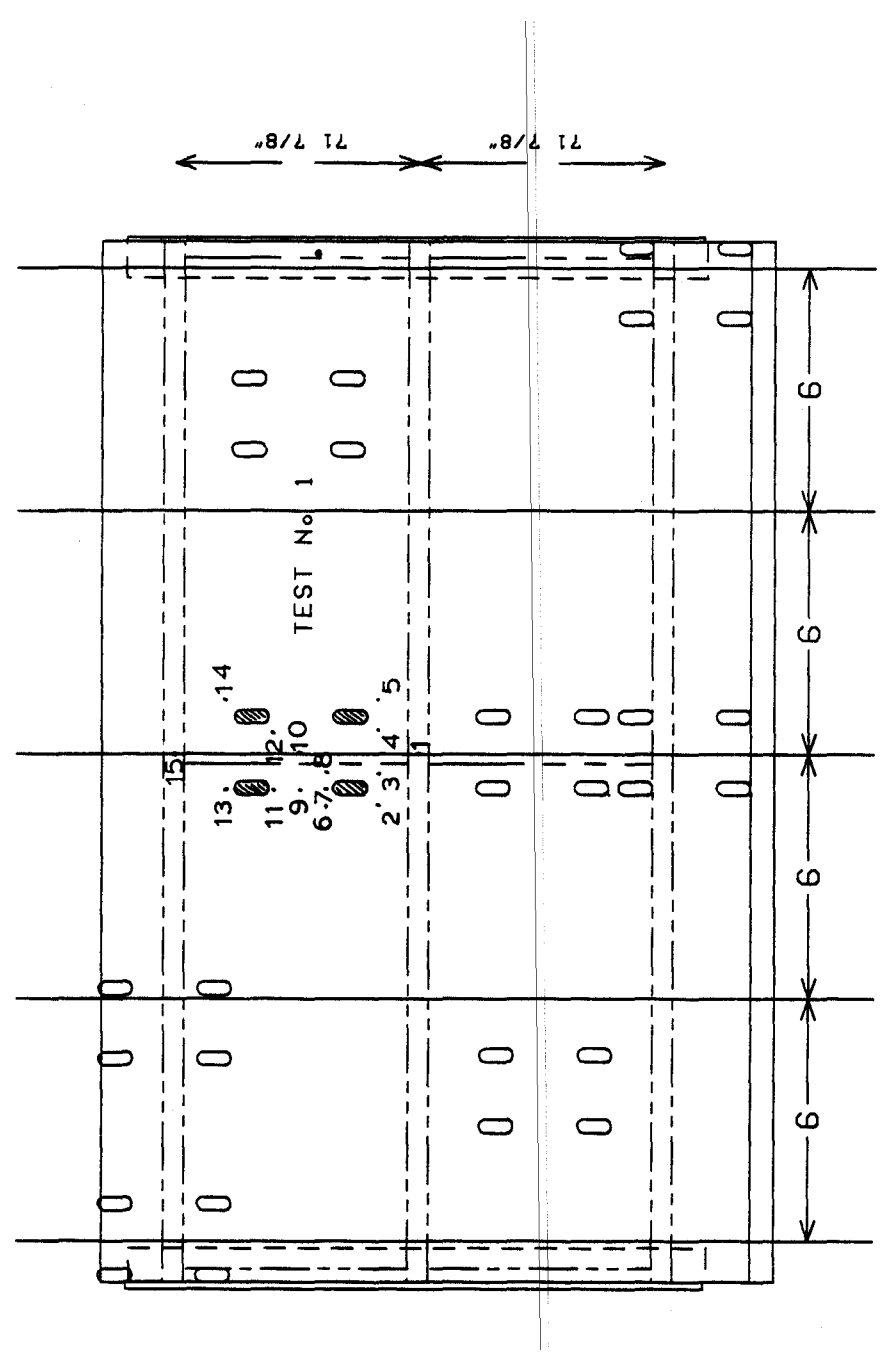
LVDT Locations (Third Bridge - Test No. 1)
